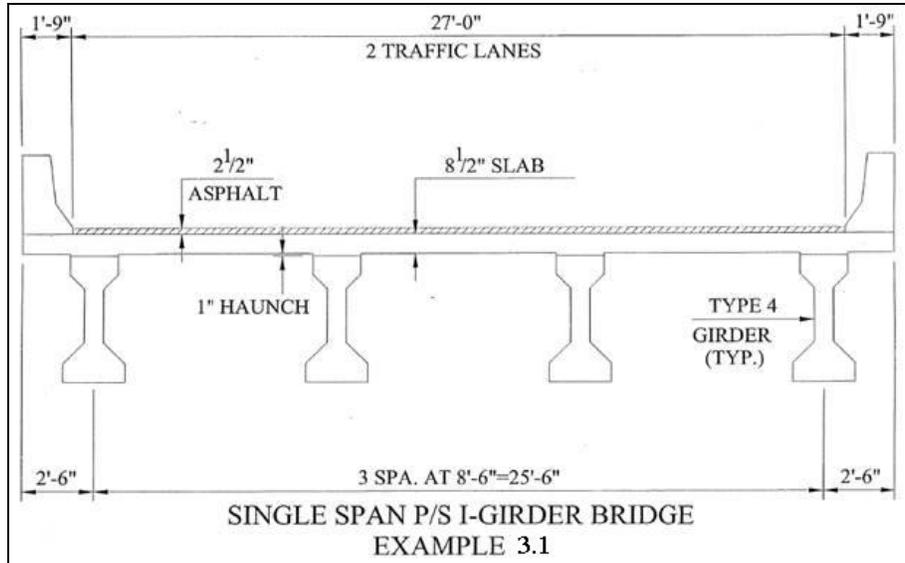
Prestressed-concrete bridge-rating example #1 cross section
